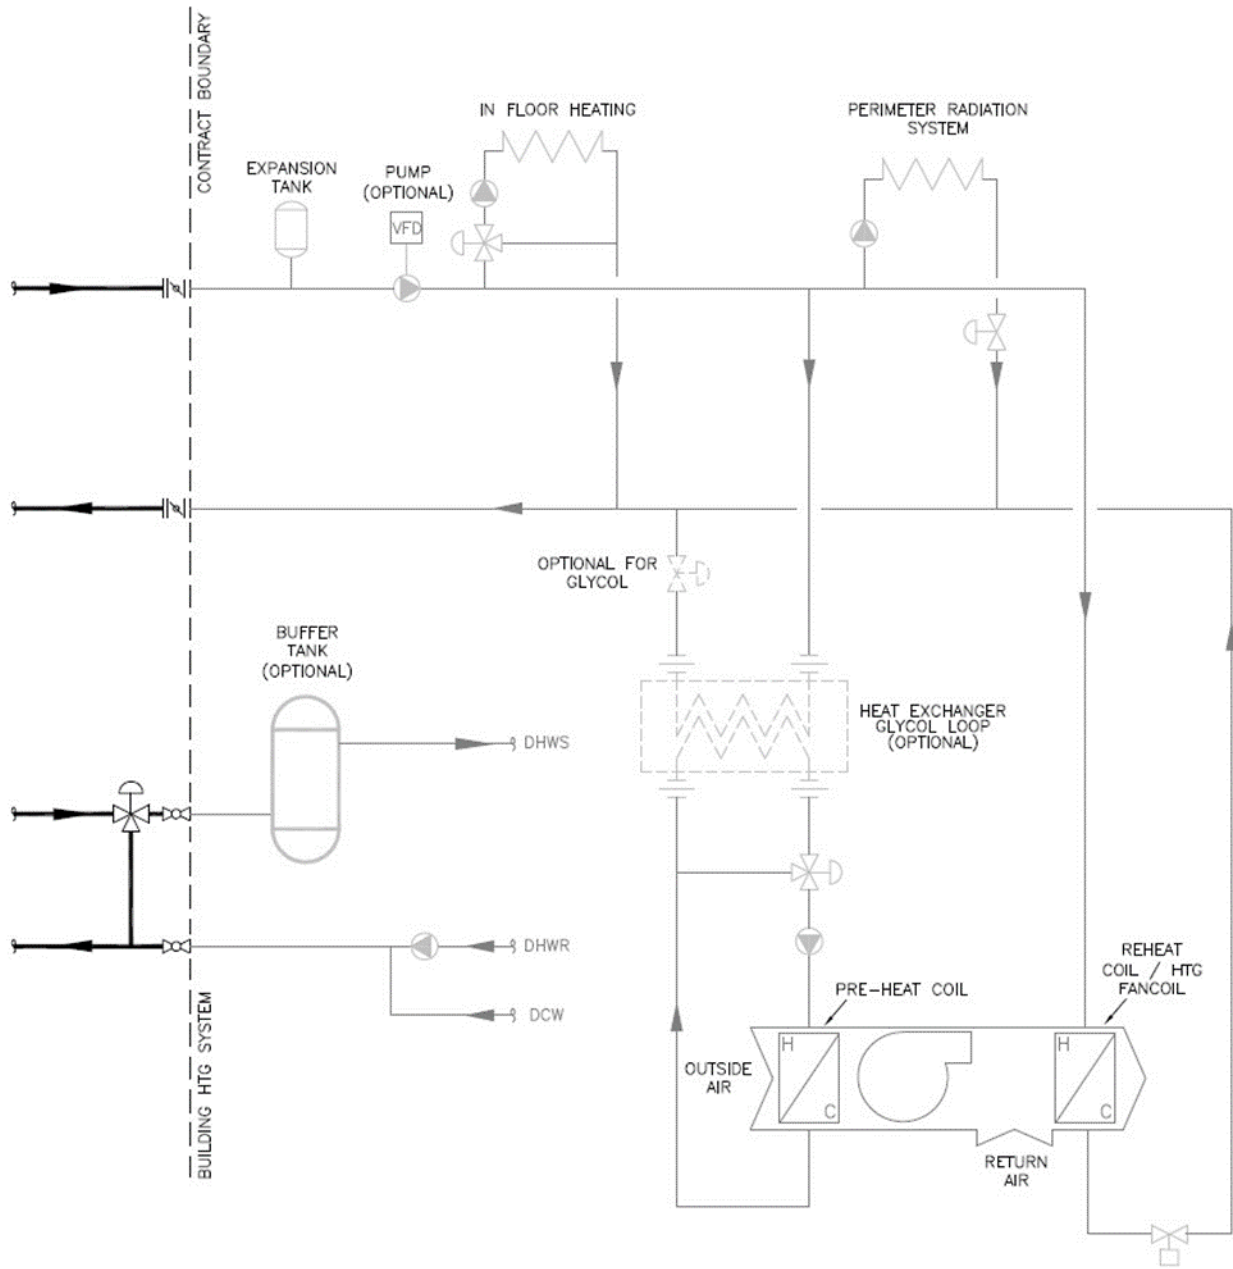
EXAMPLES OF TYPICAL SECONDARY (BUILDING) HEATING SYSTEMS
